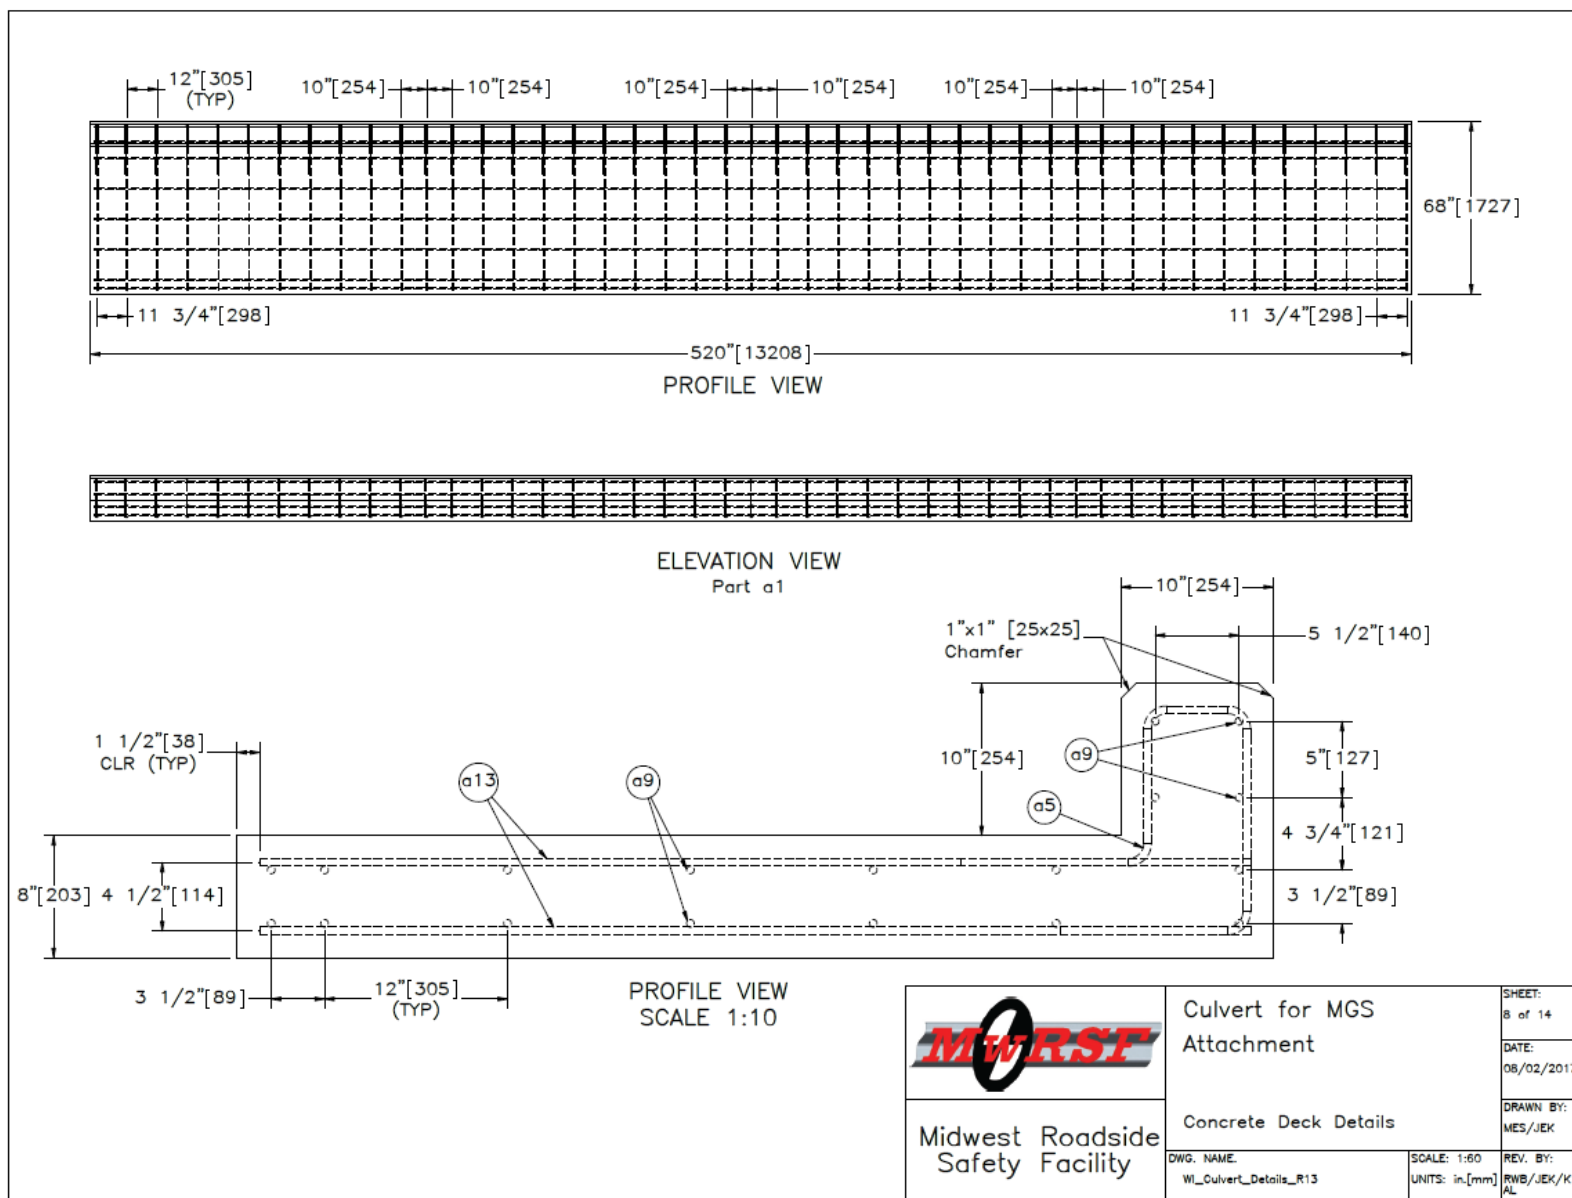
Concrete Top Slab Details, Test Nos. CMGS-1 and CMGS-2
